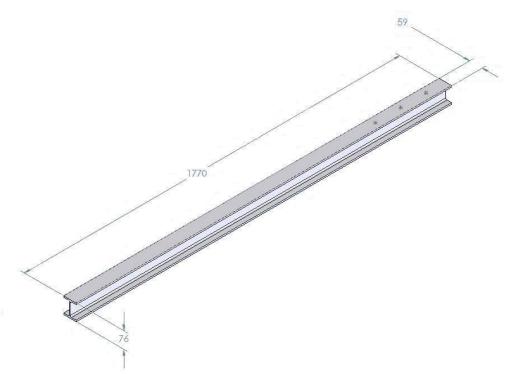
Three Strand Cable Barrier: Post (dimensions in millimeters)
